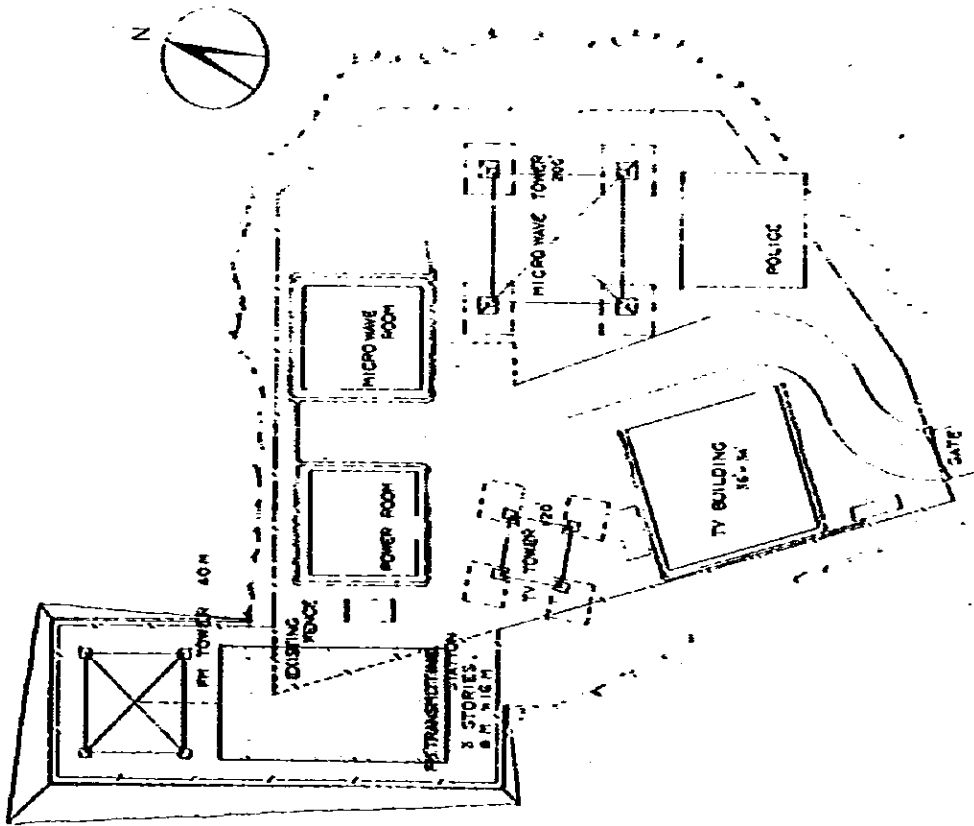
Site Plan -- Br. Bauk, Dungun
